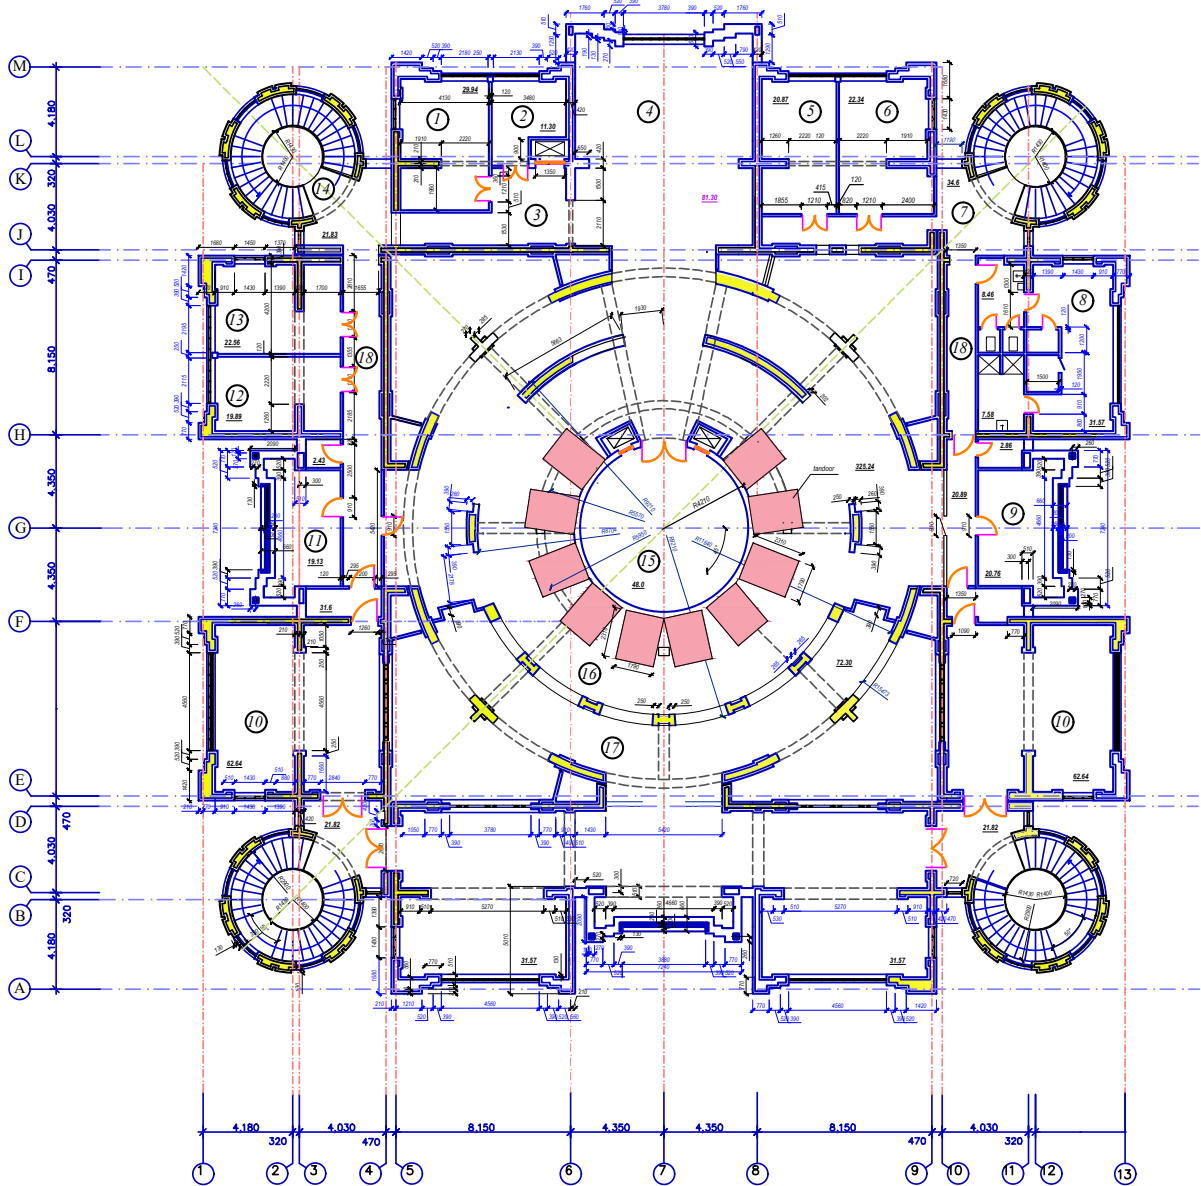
Layout of the cafeteria building that has tandoor ovens
